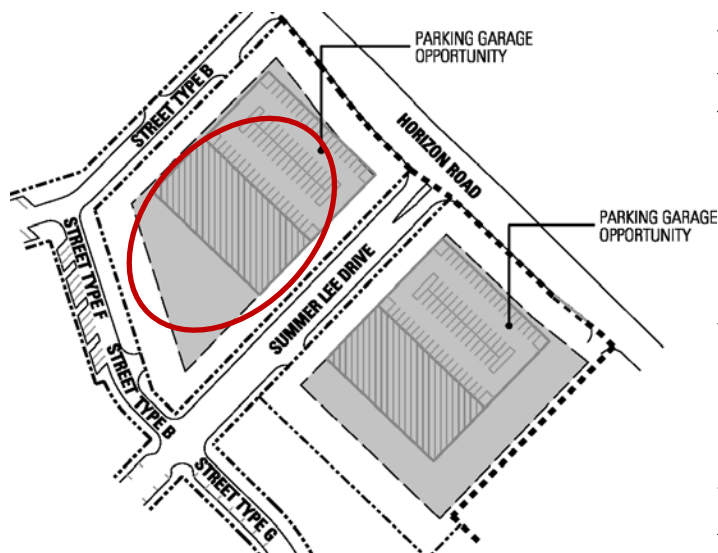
HORIZON/SUMMER LEE SUBDISTRICT CONCEPT PLAN CONTAINED IN ORDINANCE NO. 10-22
